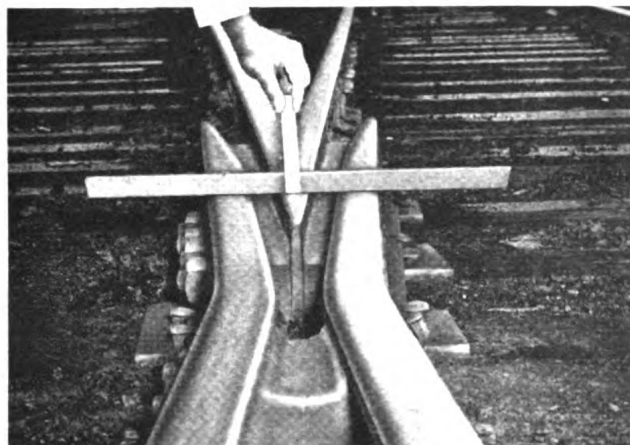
Frog point and flanges of badly worn frog before welding.
